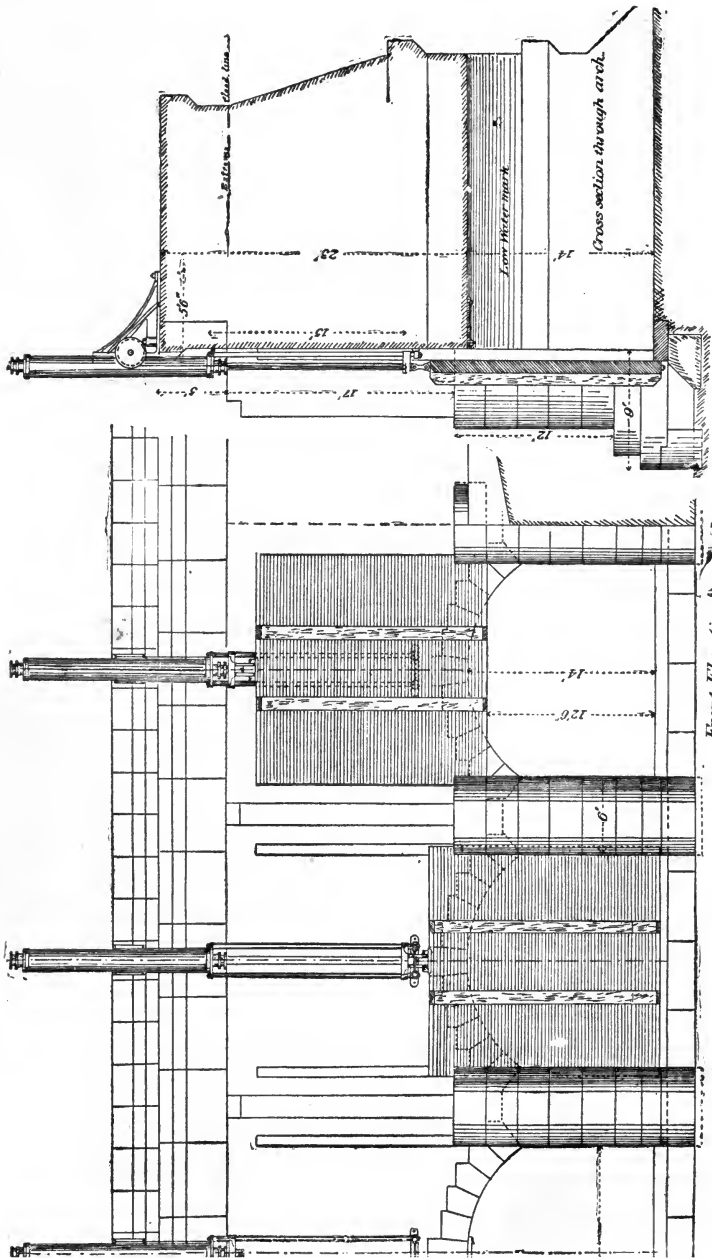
PLATE VIII.—CROSS-SECTION AND ELEVATION OF REGULATOR GATES, FOLSOM CANAL.
